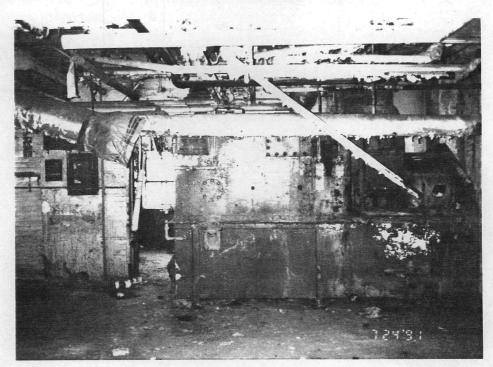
Location: Building 12 Orientation: South Date: 07/24/91 Description:
